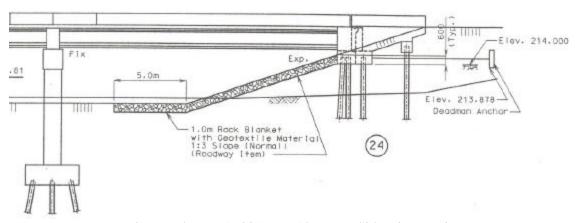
Br. A6031 East Abutment Side View Design.
